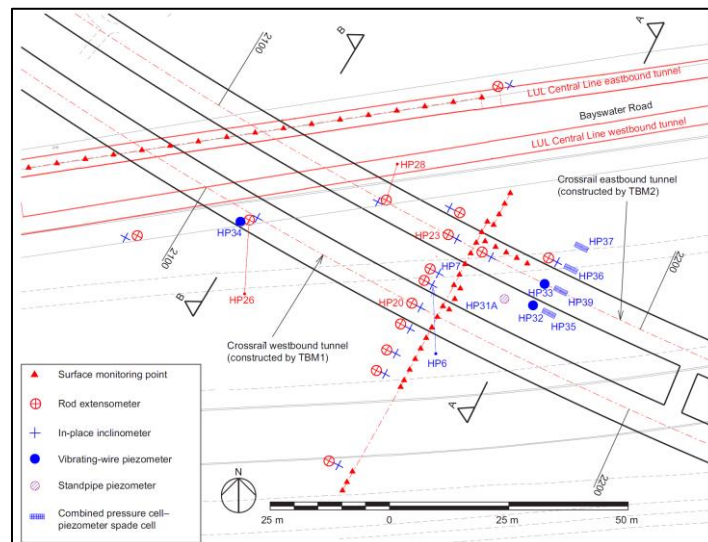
Location plan and instrumentation layout plan of Hyde Park instrumentation site (Wan et al., 2019).
